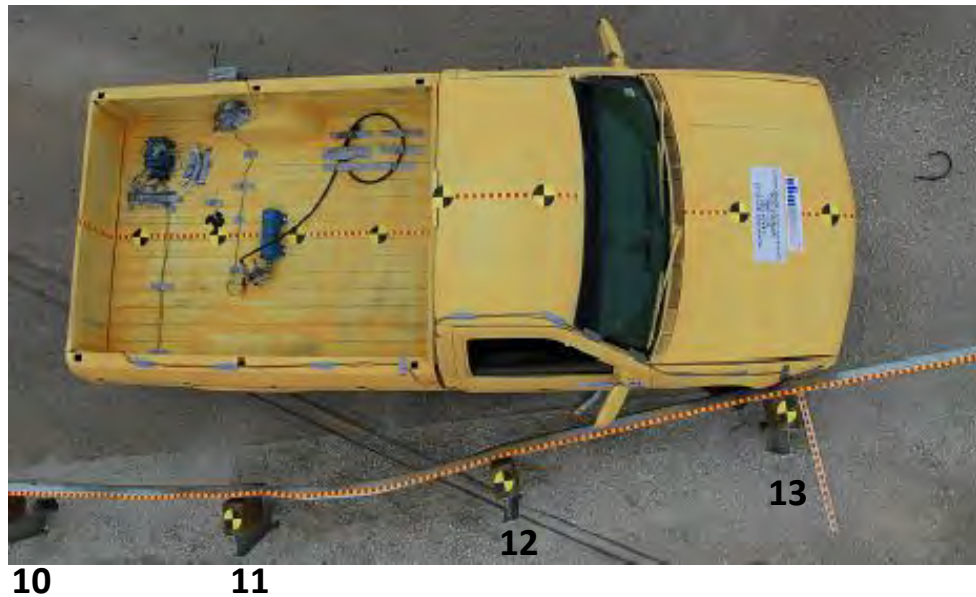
Damage to guardrail in low-speed test C08C3-027-1 (overhead view).[Fleck08a]
